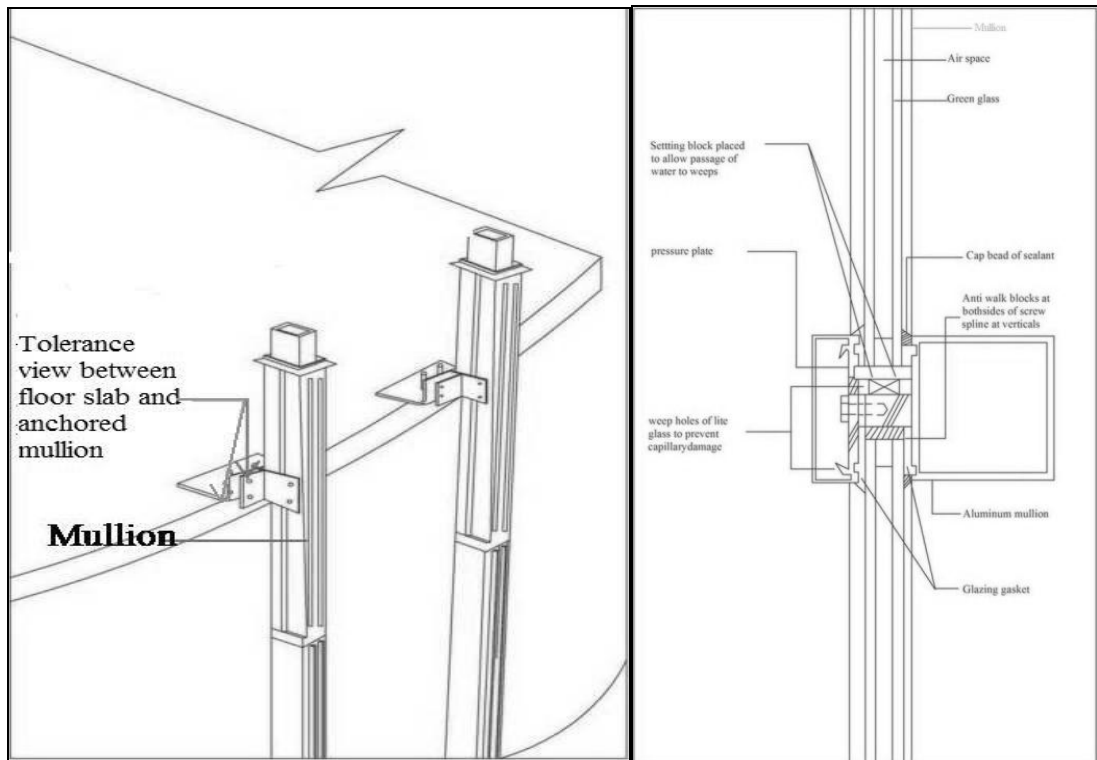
Tolerance View for the Typical Stick Curtain Wall of Shun Hing Plaza (Drawn by Author).
